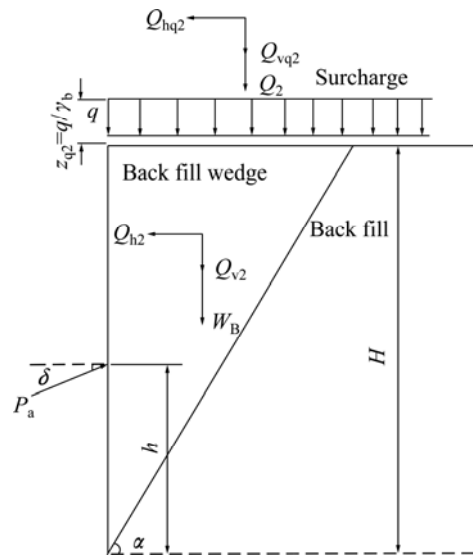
Failure mechanism of backfill and associated forces
